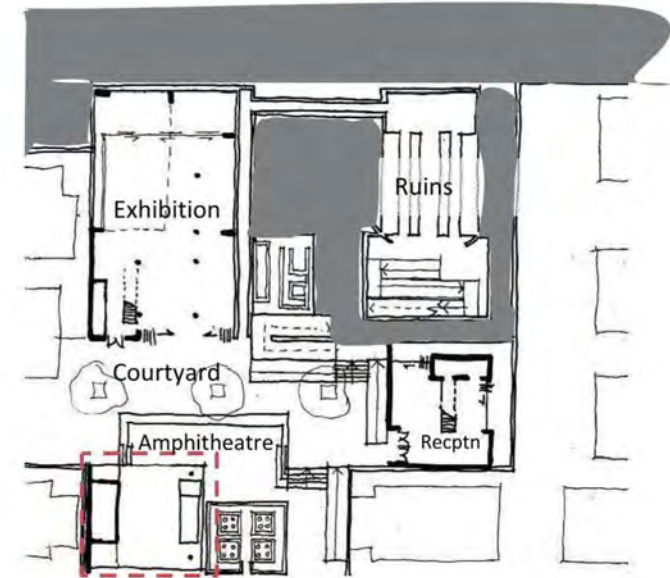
Floor plan of the proposed visitor centre Glass Art Studio
